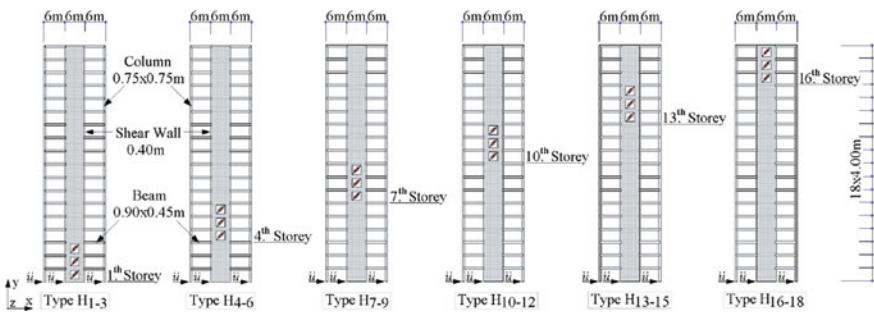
Placement of dampers within 18-storey frame-shear wall structures [4]
